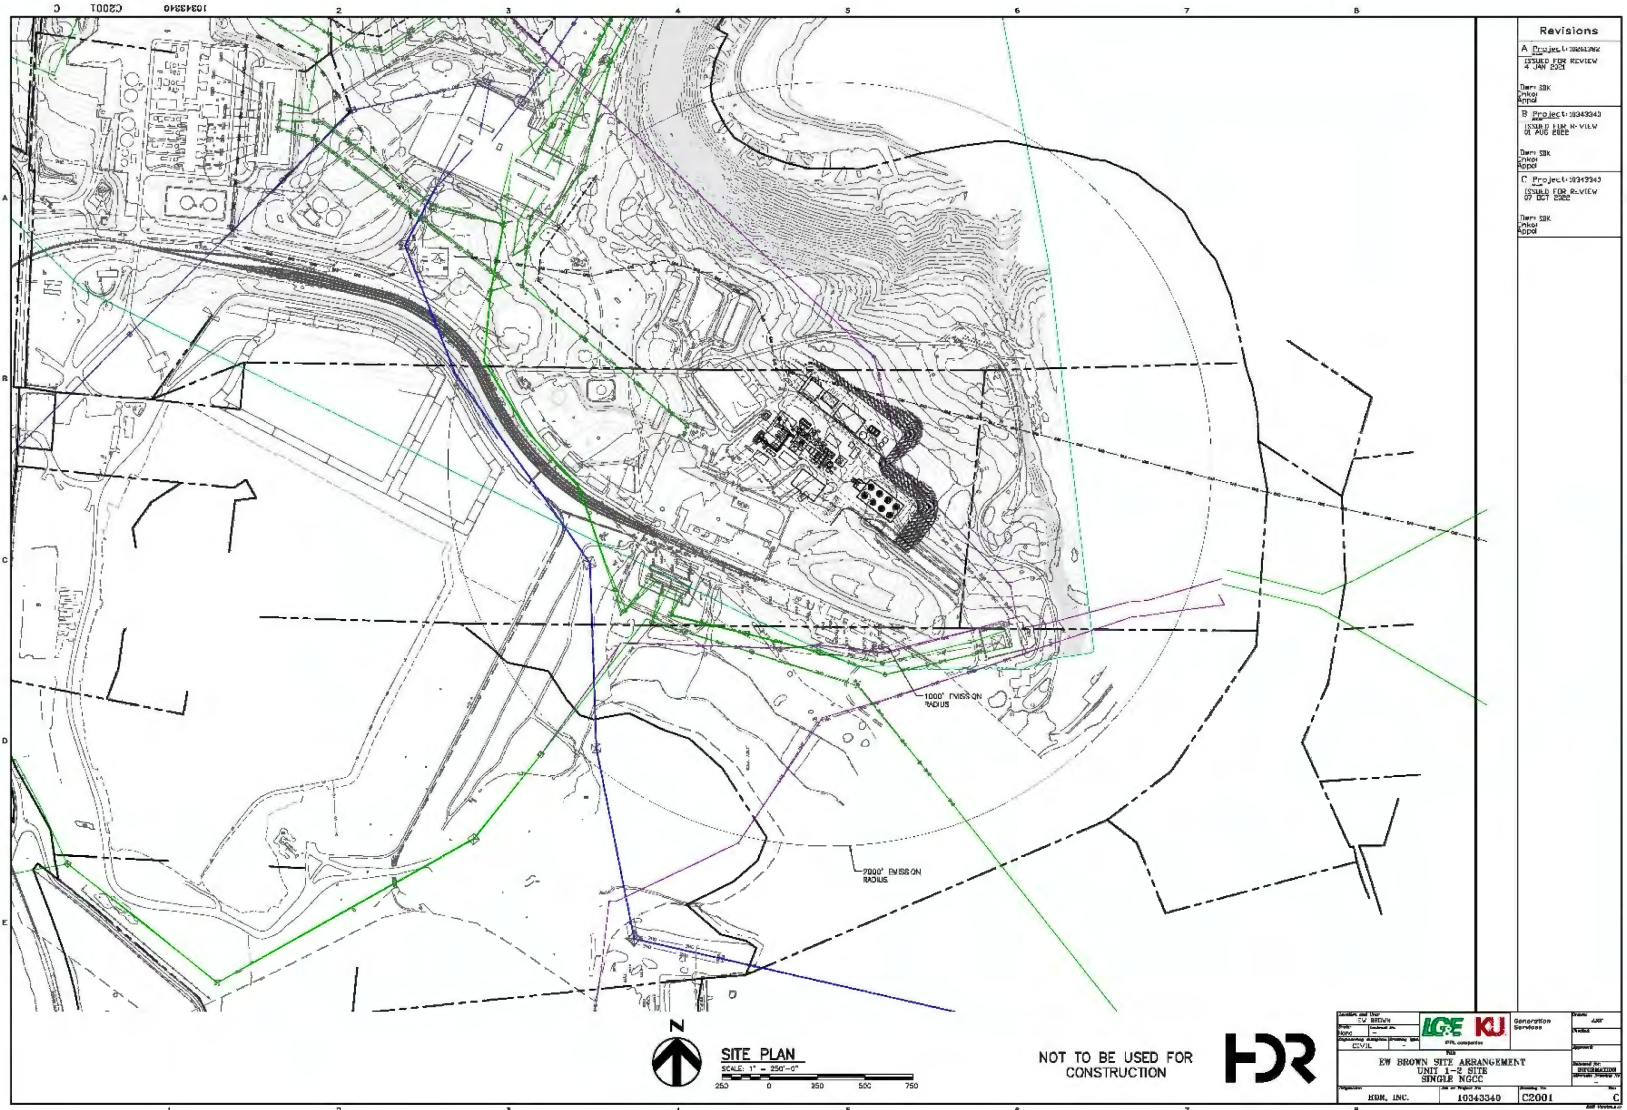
Proposed NGCC Installation Components, Infrastructure Connections and Setback
